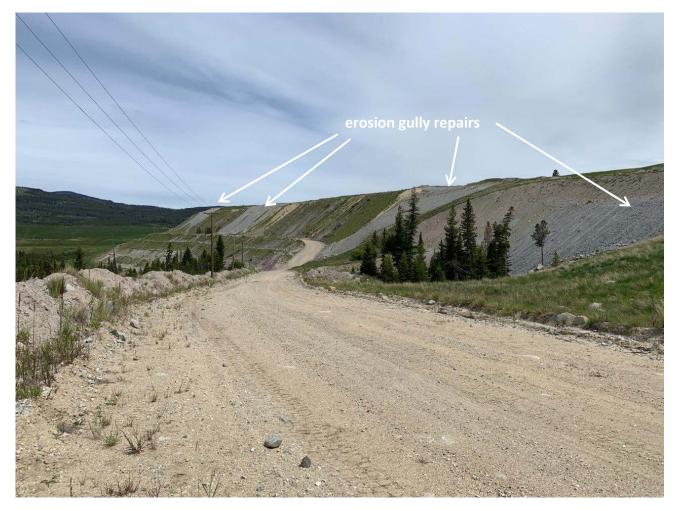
Overview of downstream slope and toe from left abutment (BTH-2019-04)
